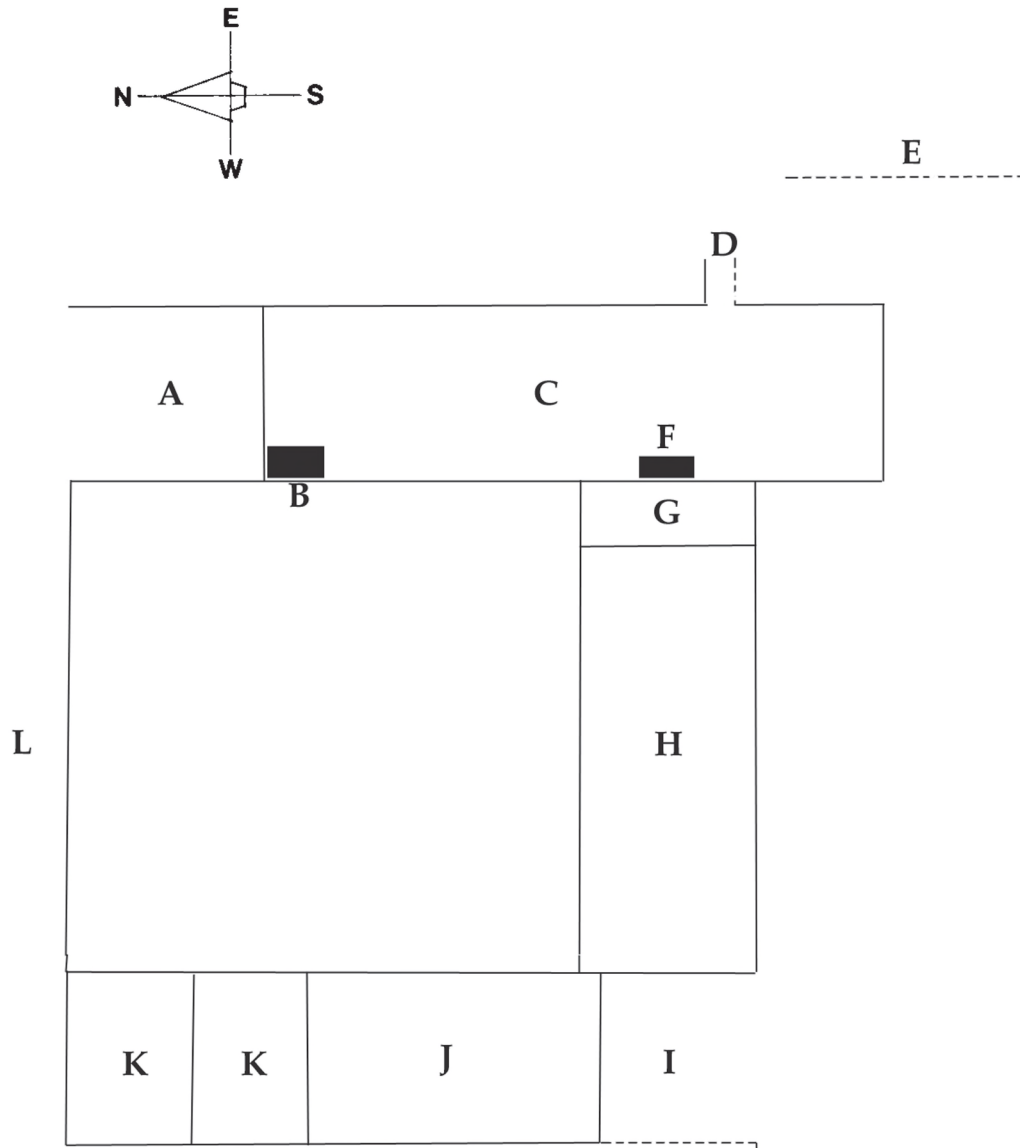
Newstead Abbey: Plan of the ground floor, 1818/19, after John Shaw.
